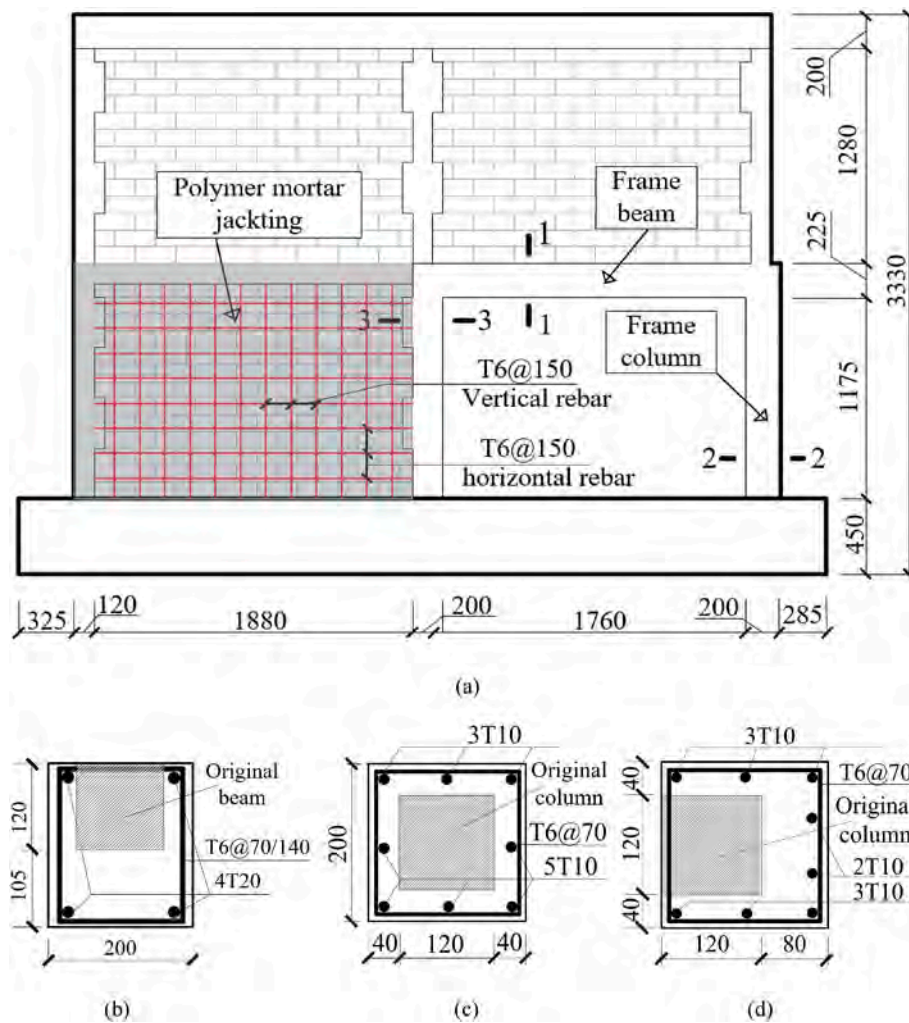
Geometric dimensions and detailing of the specimen W3 (unit: mm): (a) Overall scheme; (b) Section 1-1; (c) Section 2-2; (d) Section 3-3.
